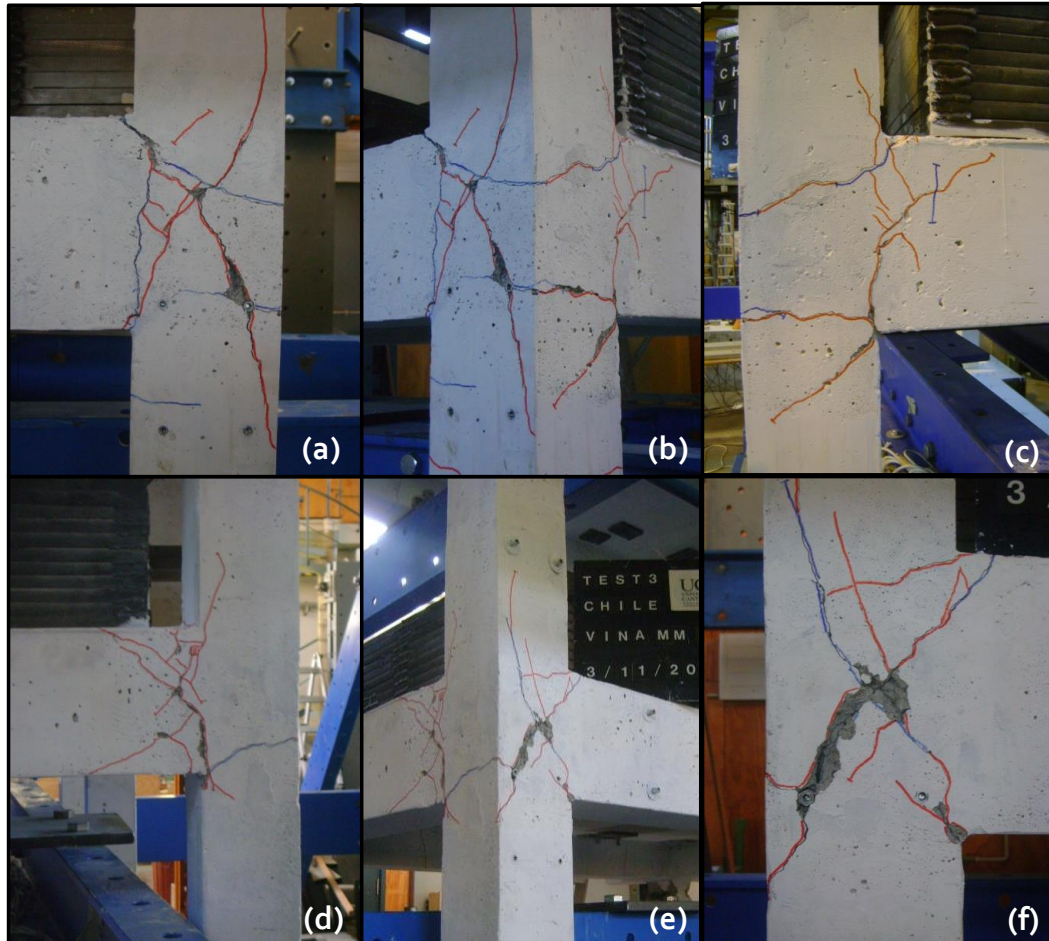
Observed damage after Test 2.2 – first floor corner beam column joints of the first floor:
